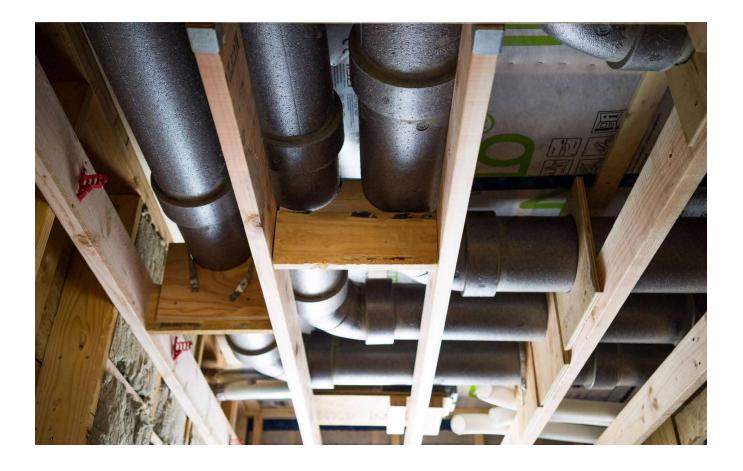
A-2: HVAC ZONES OF SURE HOUSE
